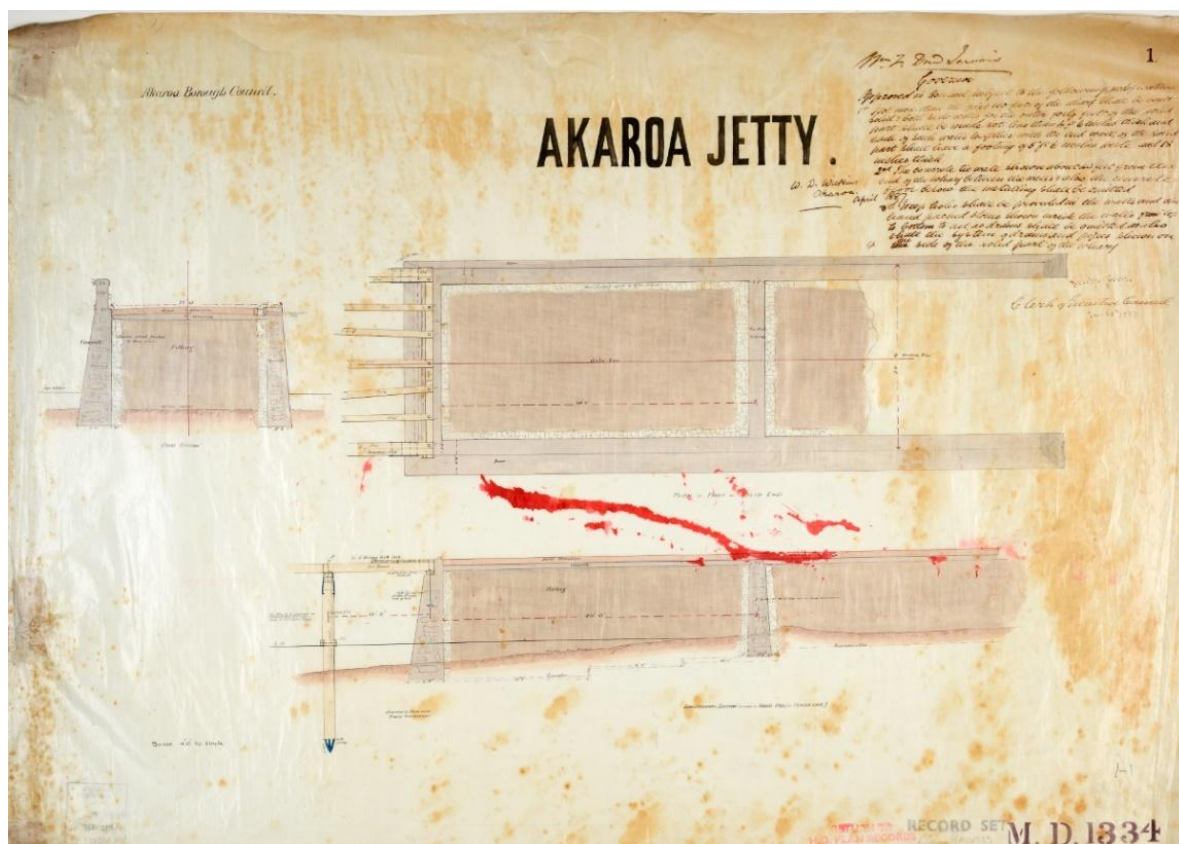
Plan, section, and elevation of concrete portion of Akaroa Wharf. Source: Wellington Archives New Zealand.
